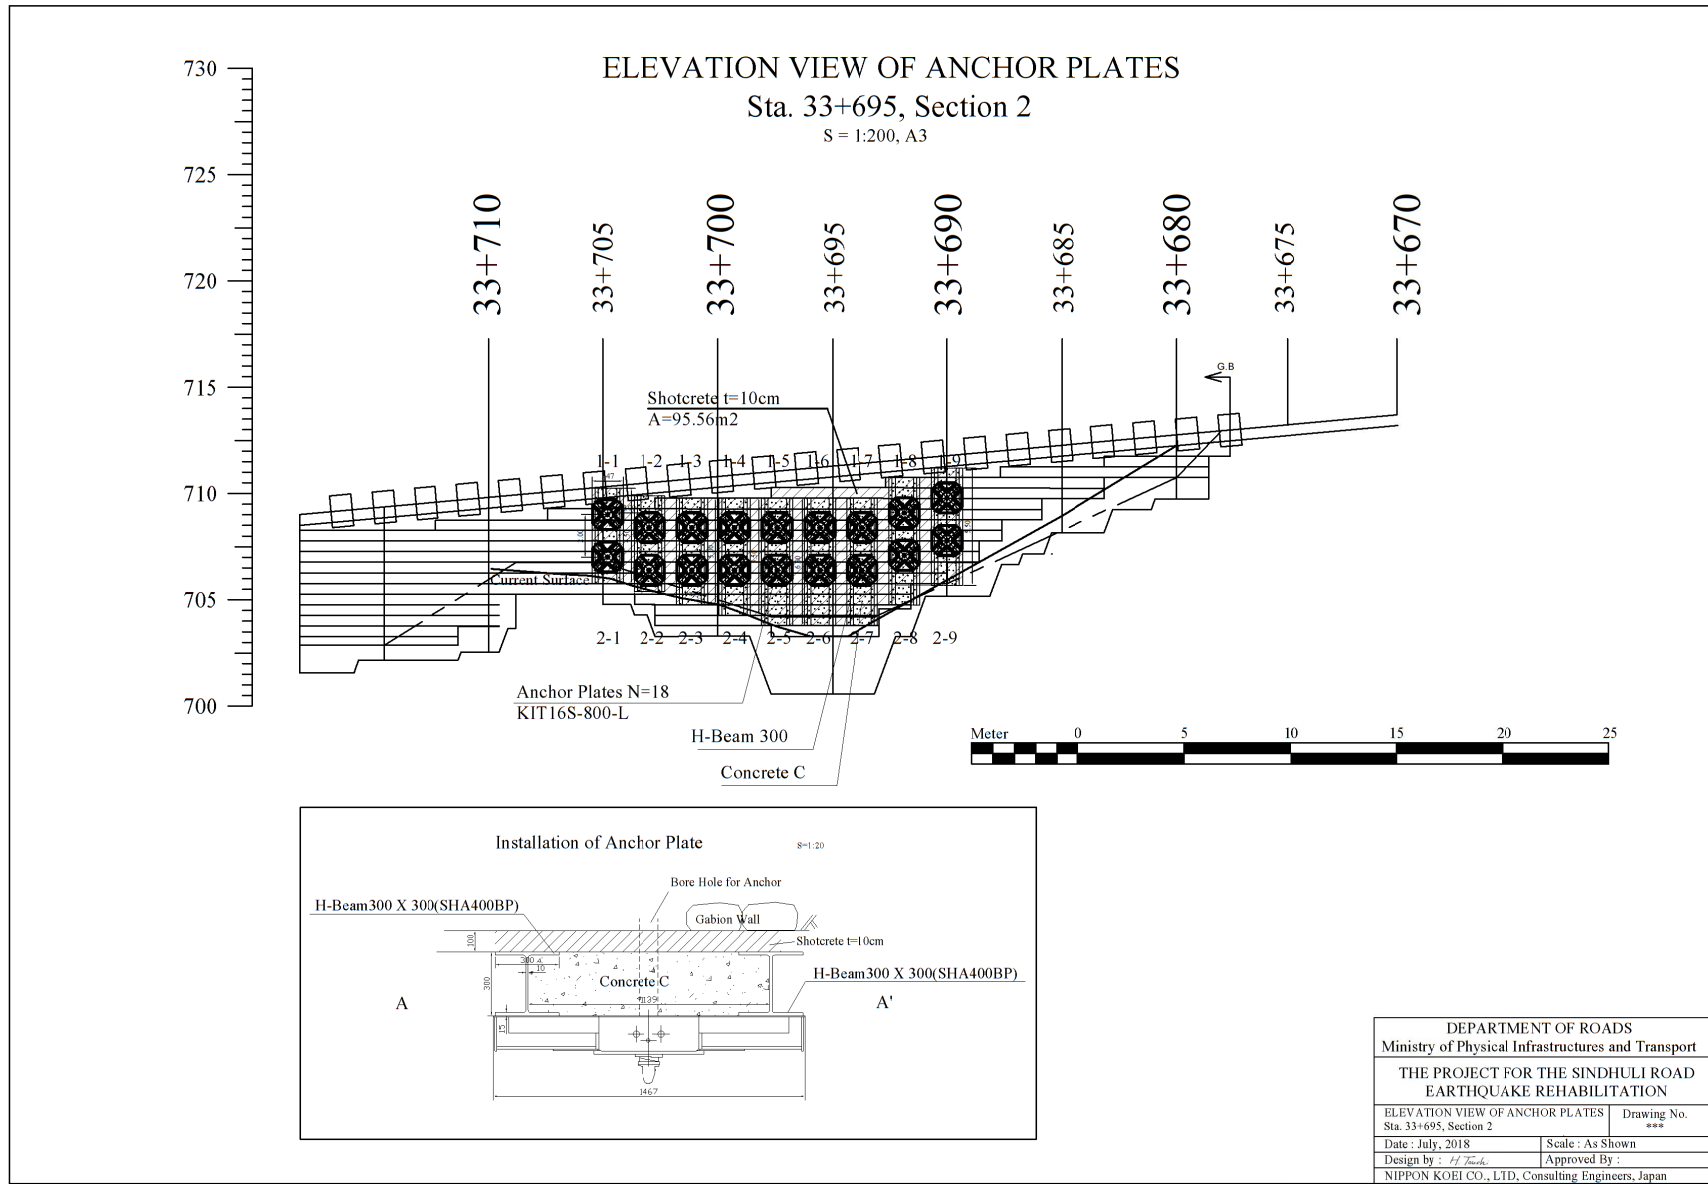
Plan of Slope Protection Works of Sta.33+695 (Non-Scale)
